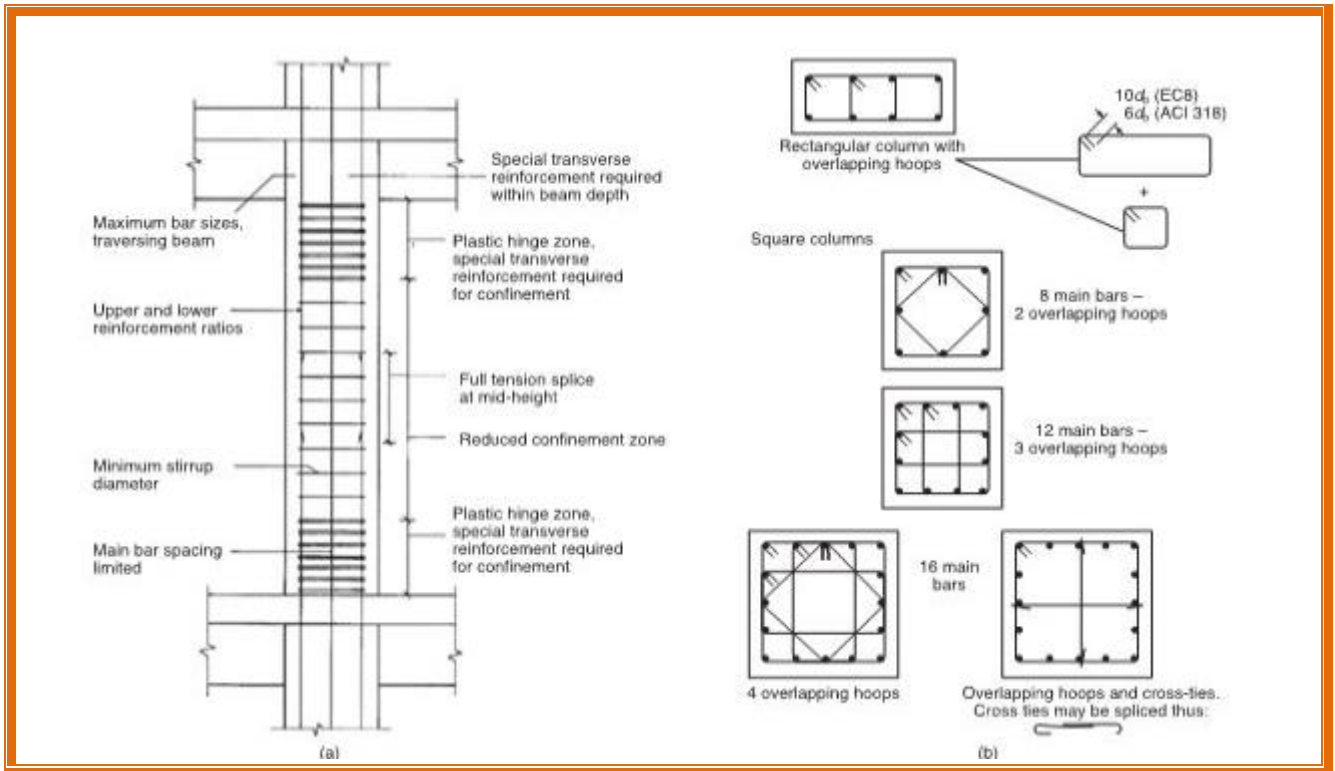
the detailing of ductile Column reinforcement (Booth and Key, 2006)
